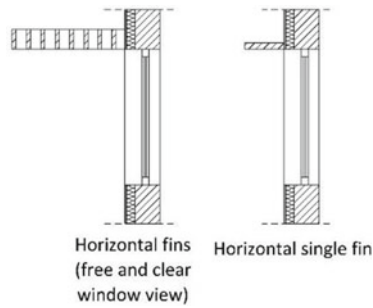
Shading devices: horizontal fins above the window—vertical section through a window. The concept can be applied the same for the vertical fins by looking at the drawing as a horizontal section
